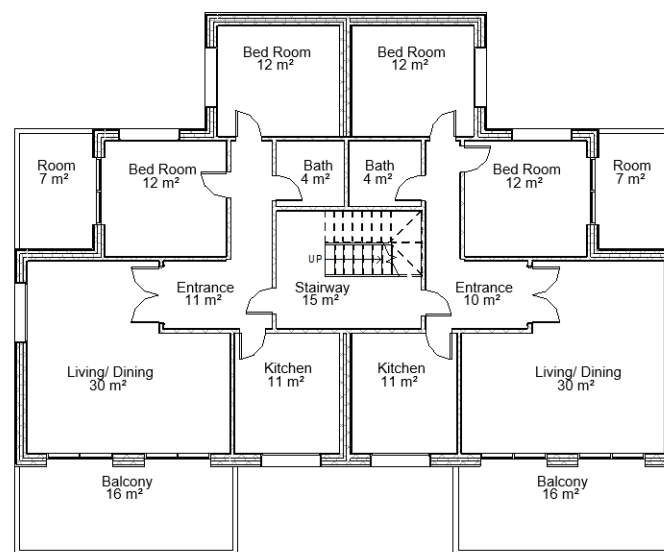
Typical plan to be used for simulations for balcony structure surrounded by 1 wall overlooking the west orientation, Source: Author
